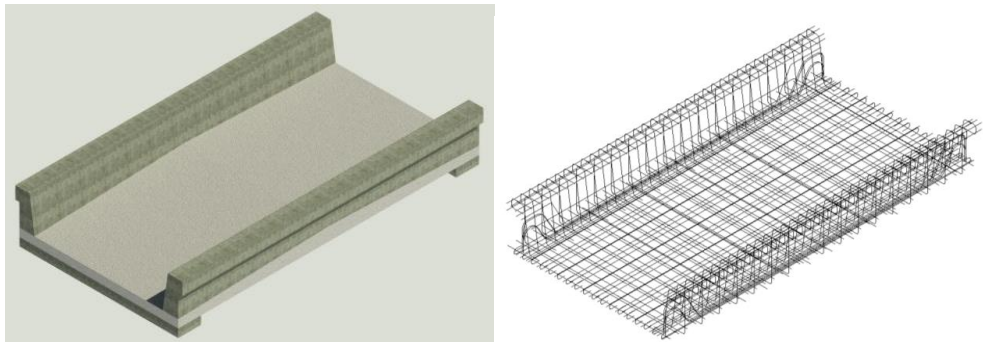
Renderings of Trough Bridge (left), and Trough Bridge reinforcement (right) from Revit.
